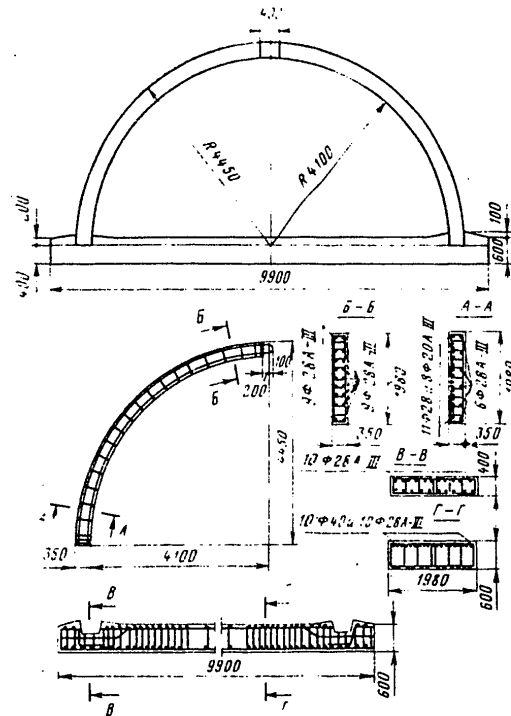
Cross-Section and Reinforcement Schematics of Structural Components of Underground, Fuel-Delivery Tunnels
